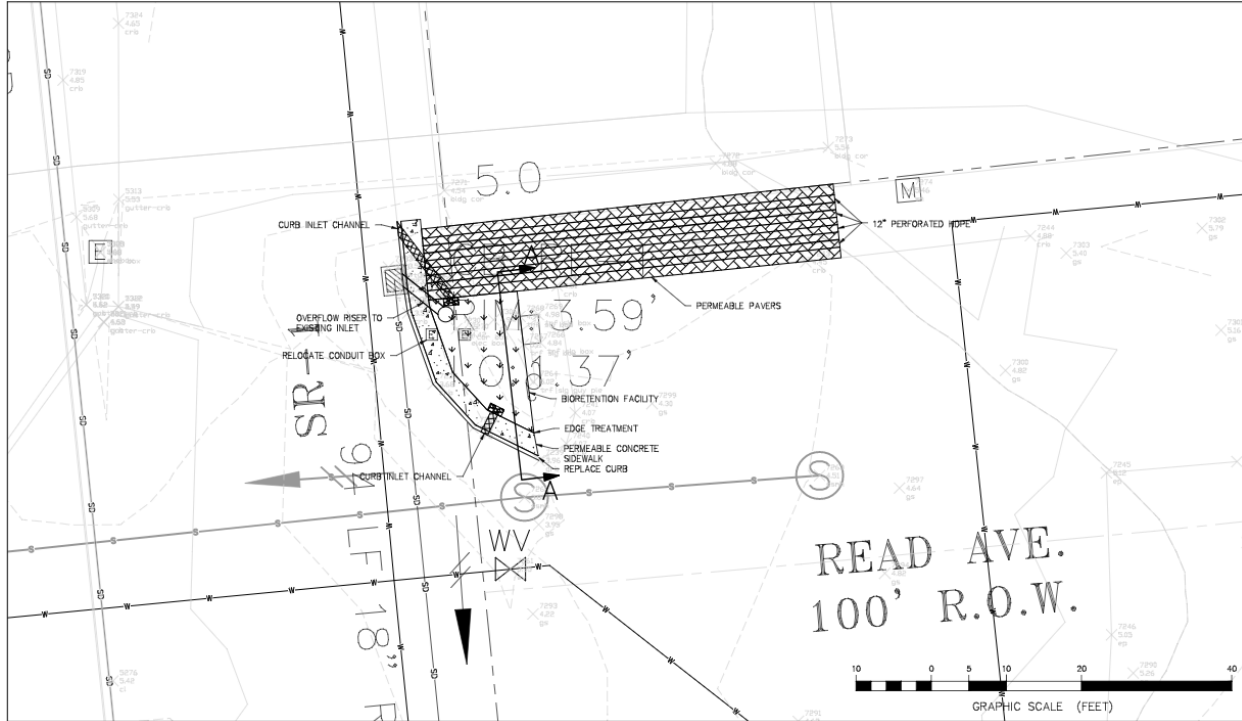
Placement and footprint of major design elements (landscaped bioretention area and infiltration trench with permeable pavers).
